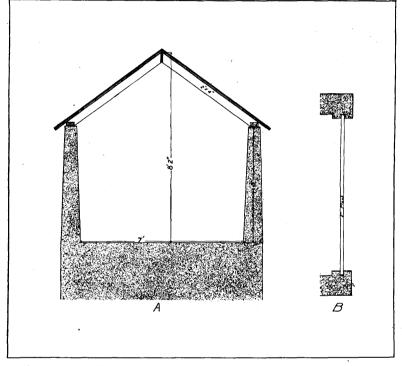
A. Cross section of manure shed, showing dimensions and plan of construction. B. Horizontal section of front, showing planks in the grooves in the cement walls.
